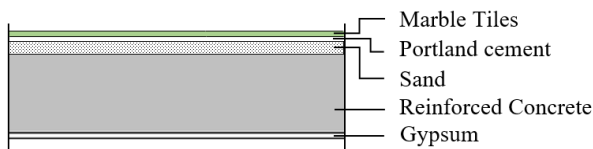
Slab construction cross section. Floor coating with marble tiles which near of reinforced concrete layer. This usually produced problems like (condensation and mold growth) under the floor coating.
